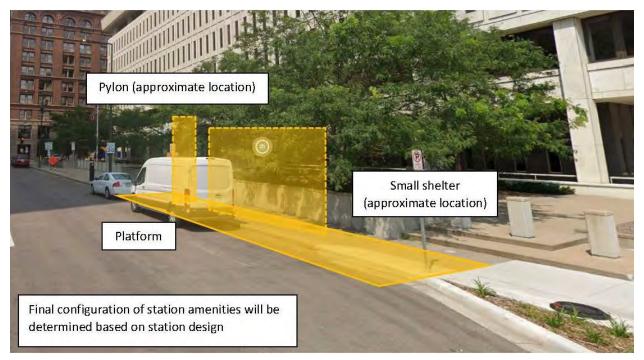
Robert Street North and Kellogg Boulevard proposed northbound platform adjacent to the Warren E. Burger Federal Building and US Courthouse.
